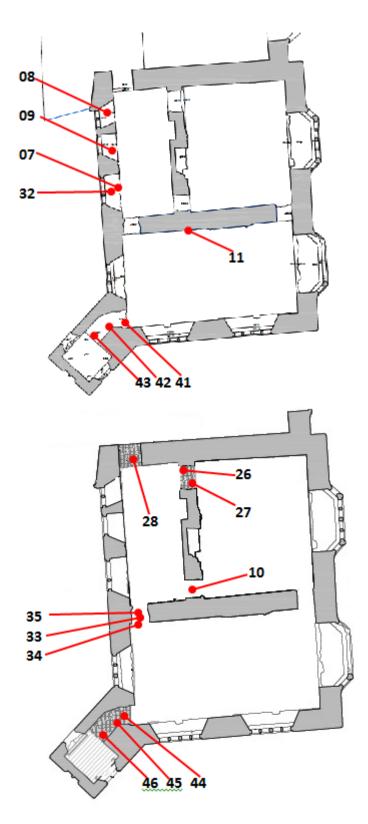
/d: Plans of the building to help locate sampled timbers (after Purcell Miller Tritton)
